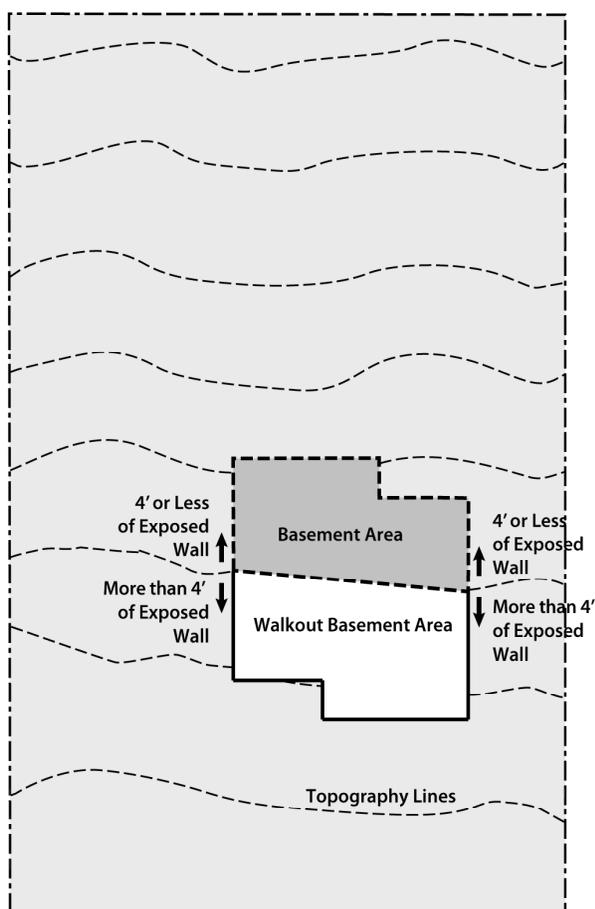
Measurement of basement and walkout basement areas – *Plan View
